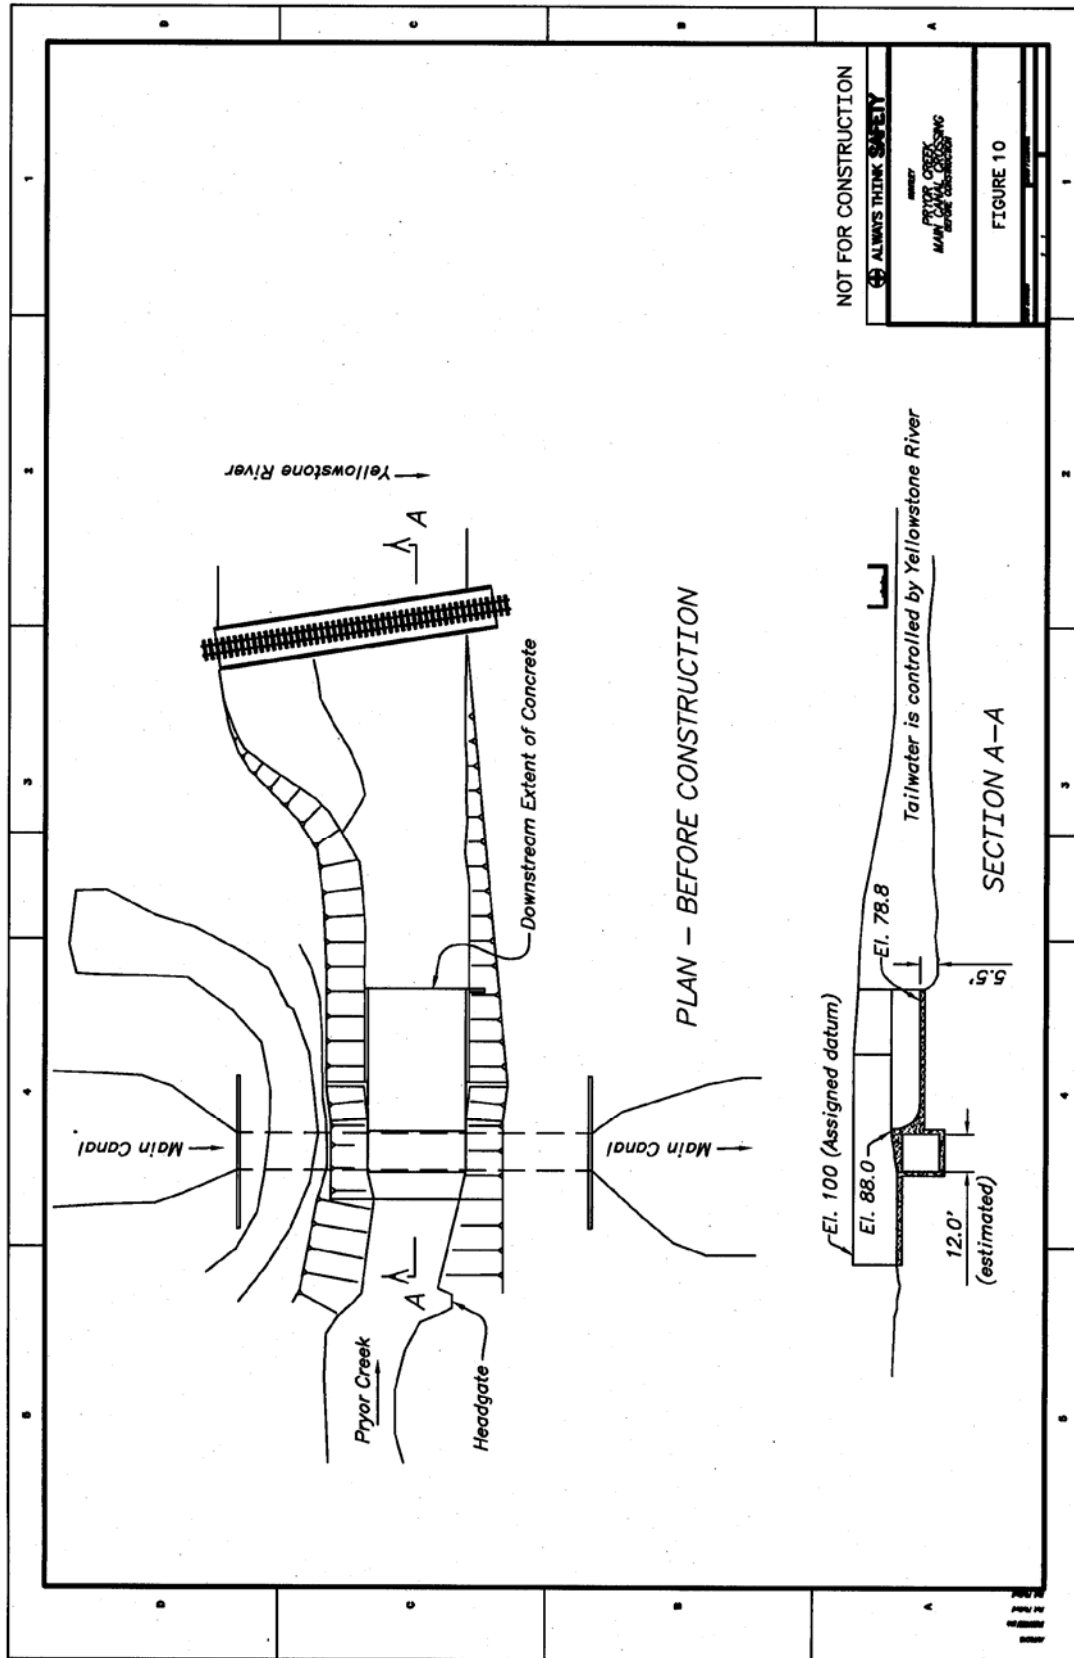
Plan and sections for Huntley Canal crossing at Pryor Creek
